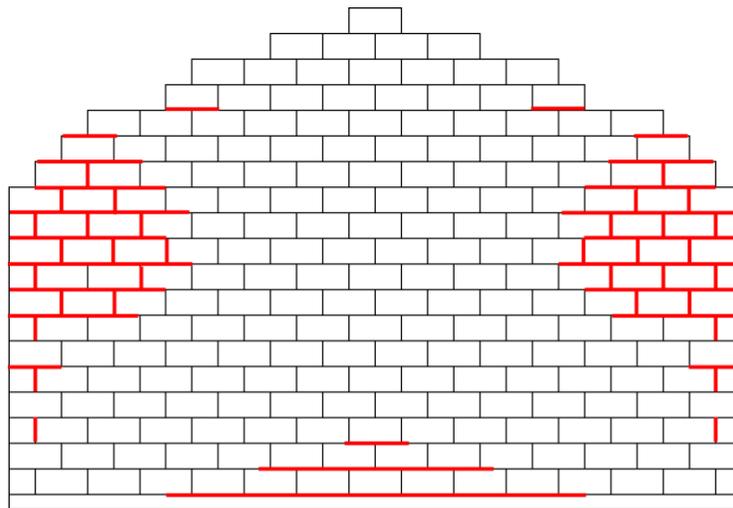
Predicted initial crack pattern for the unsupported gable wall
